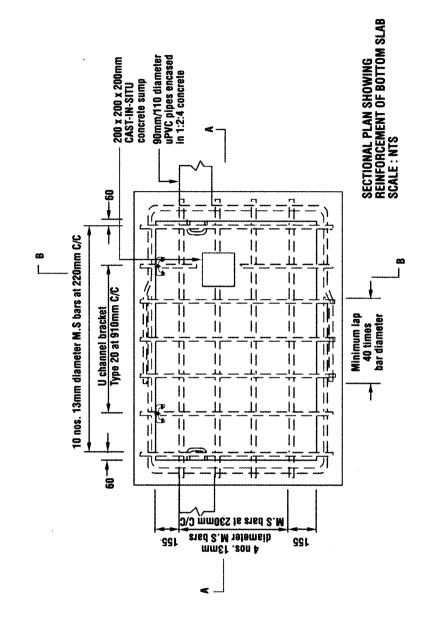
MANHOLE DRAWINGS - TYPE MX1
